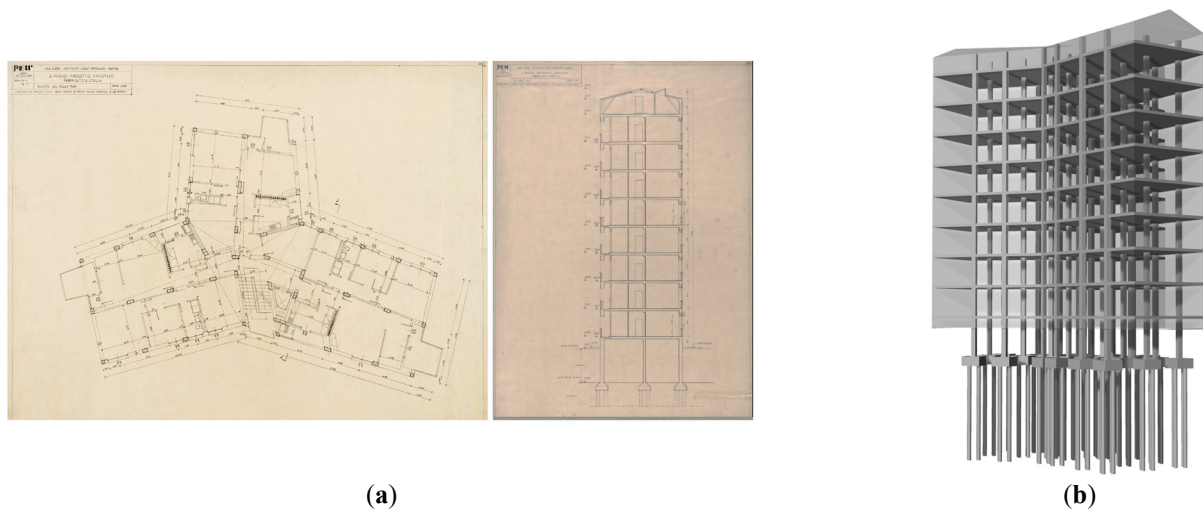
(a) Original design drawings of a *Valco San Paolo* INA-CASA housing district (1949–1952): M. De Renzi, star-shaped plan tower, plan of the first floor and section AA, 27 June 1950, 1:50 (courtesy of Accademia Nazionale di San Luca); (b) 3D model of the structure of the Tower n. 1.
